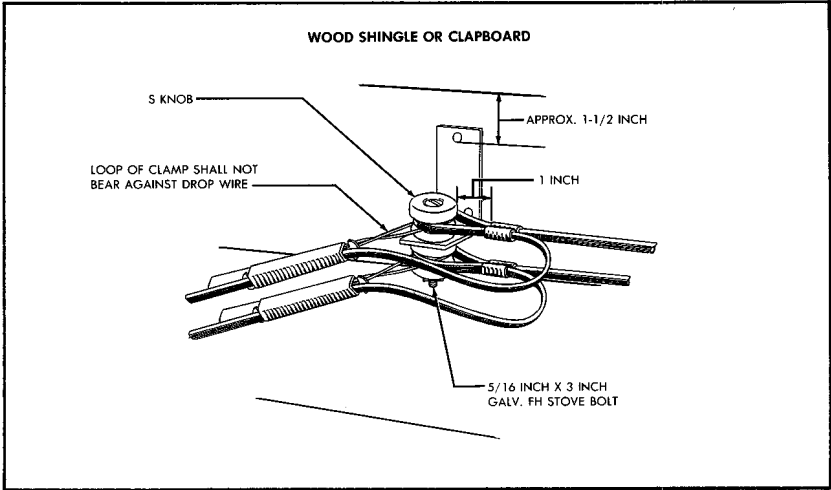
First Attachment, House Bracket (Drop Wire Run in Horizontal Direction On Building)
